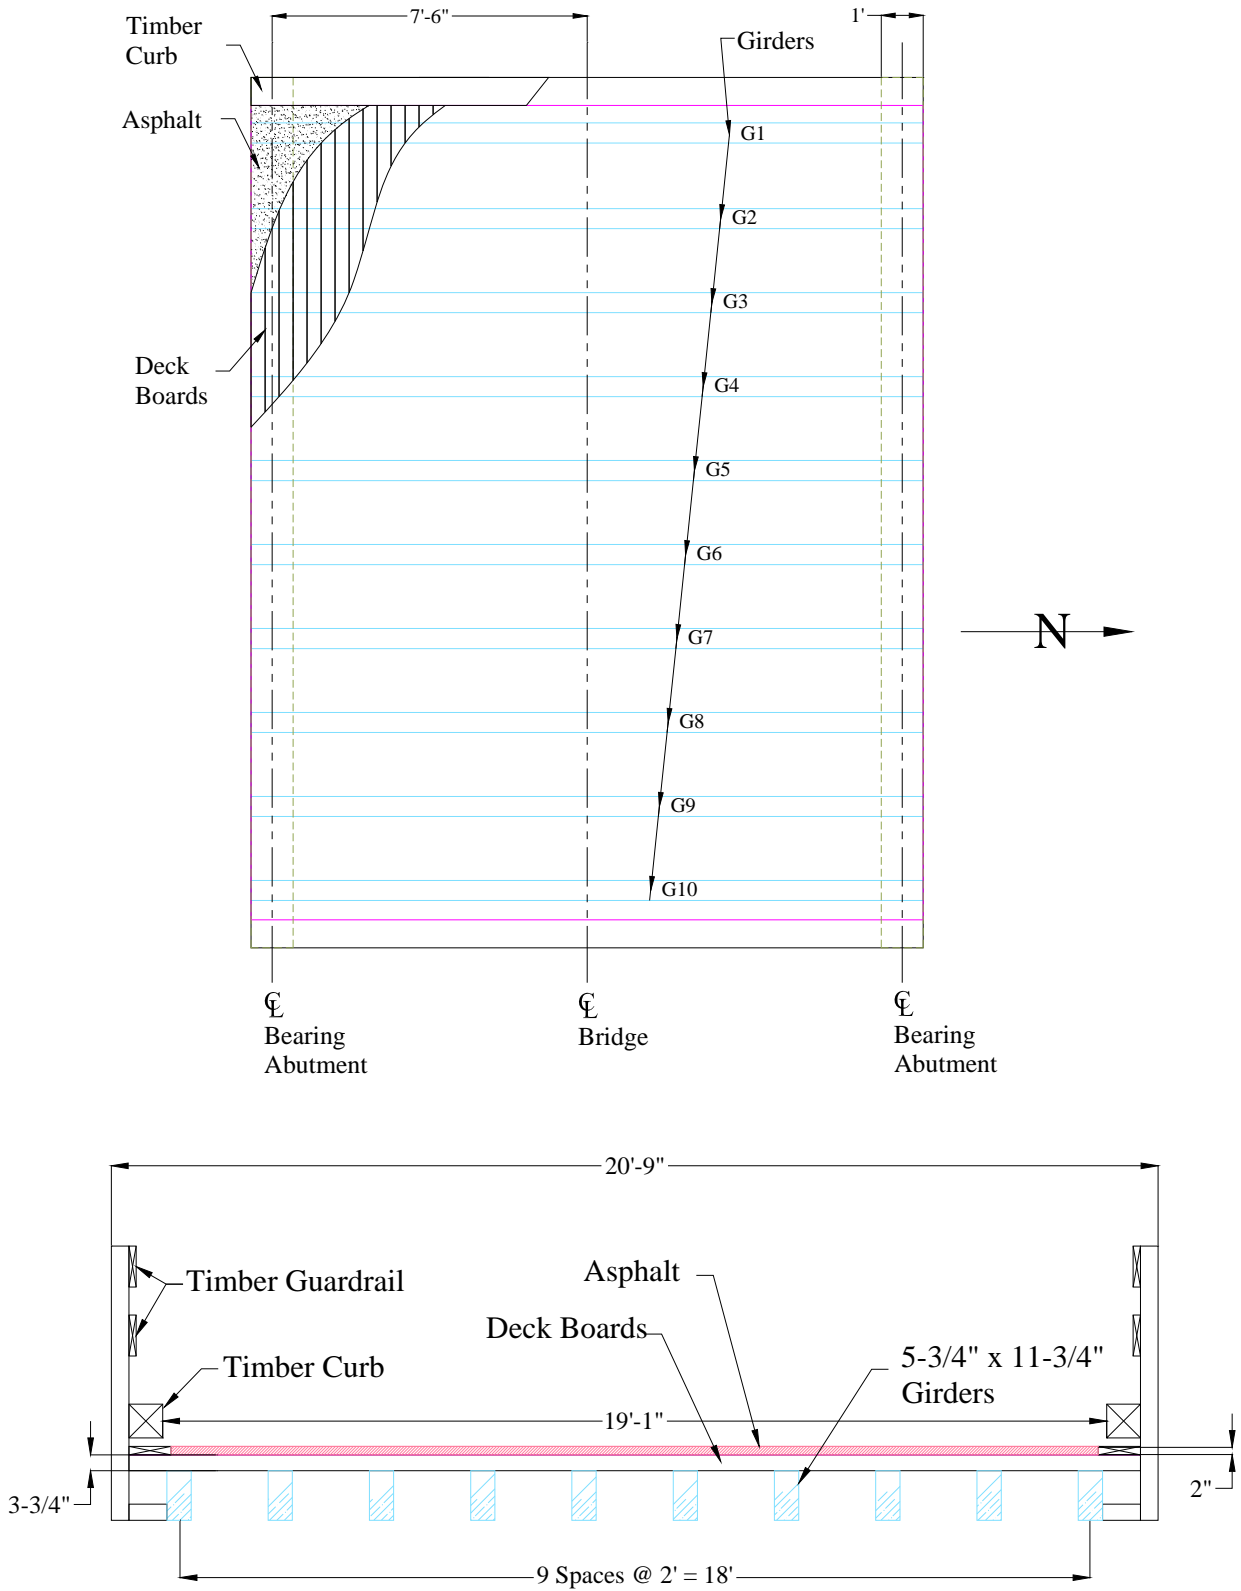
Plan and Profile Layout of Red Horse Creek Bridge
